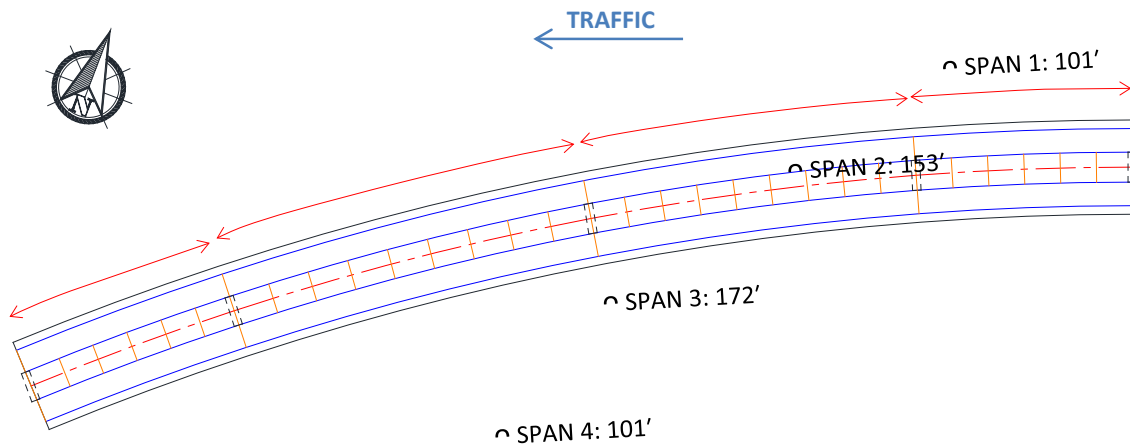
Dimensioned plan view of the I-5 Interchange Bridge.
